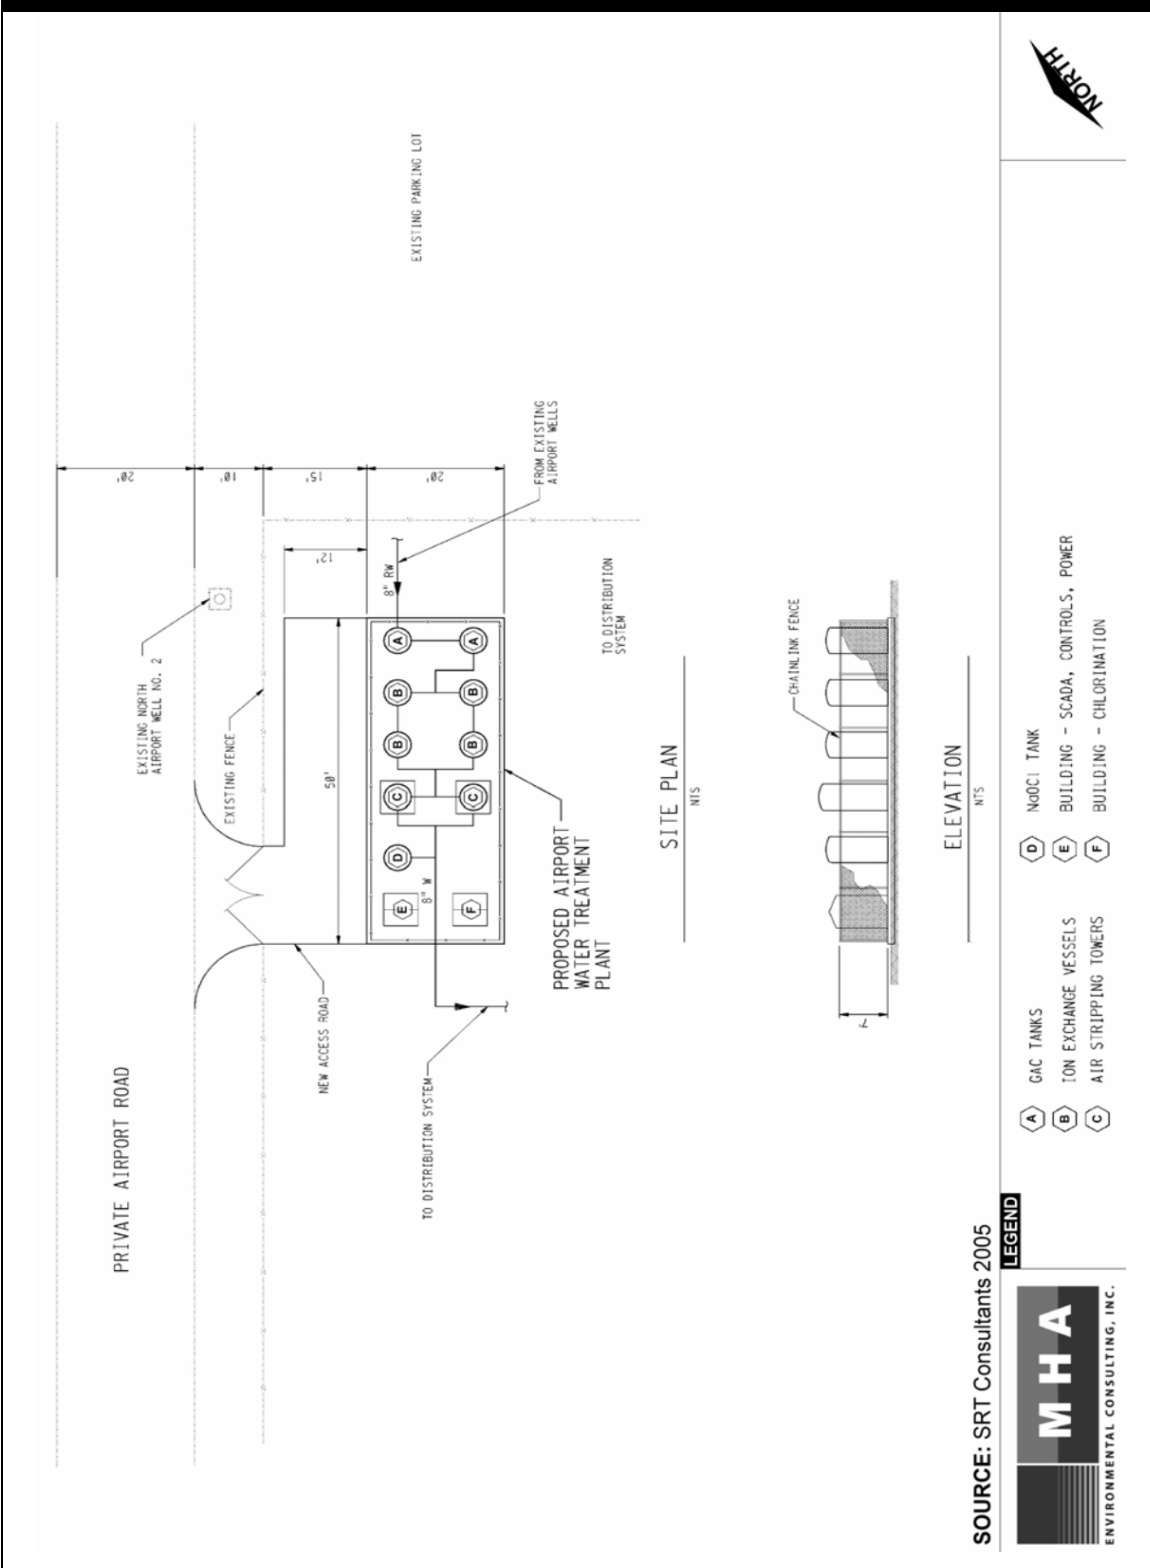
Airport Wells Proposed Water Treatment Plant Site Plan and Cross Section
